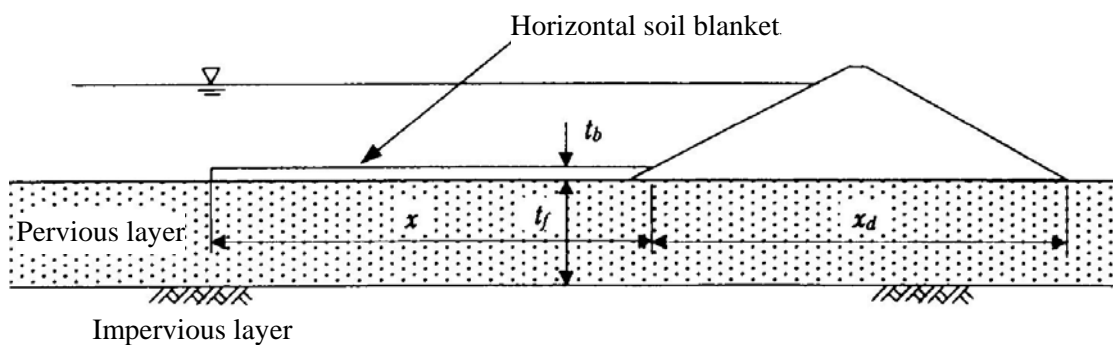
Sealing of Gravel Foundation by Blanket (1)
